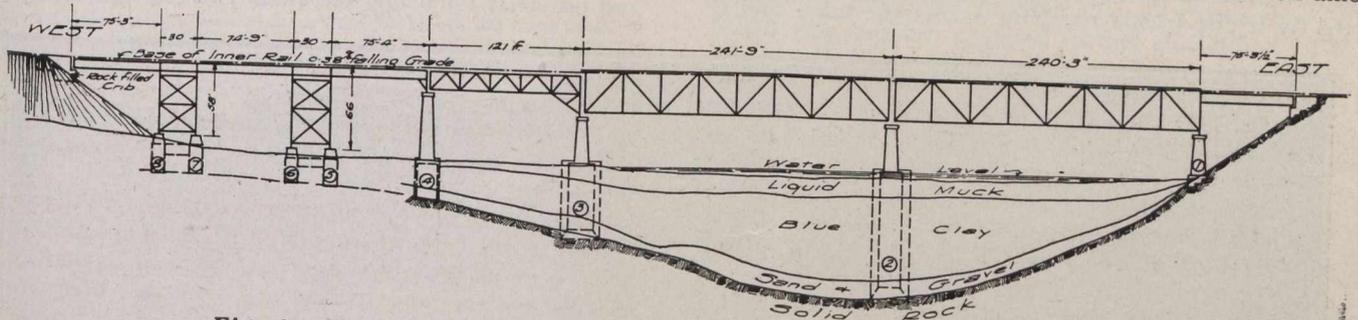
New Canadian Pacific Railway Bridge Over Mud Lake, Ont.
